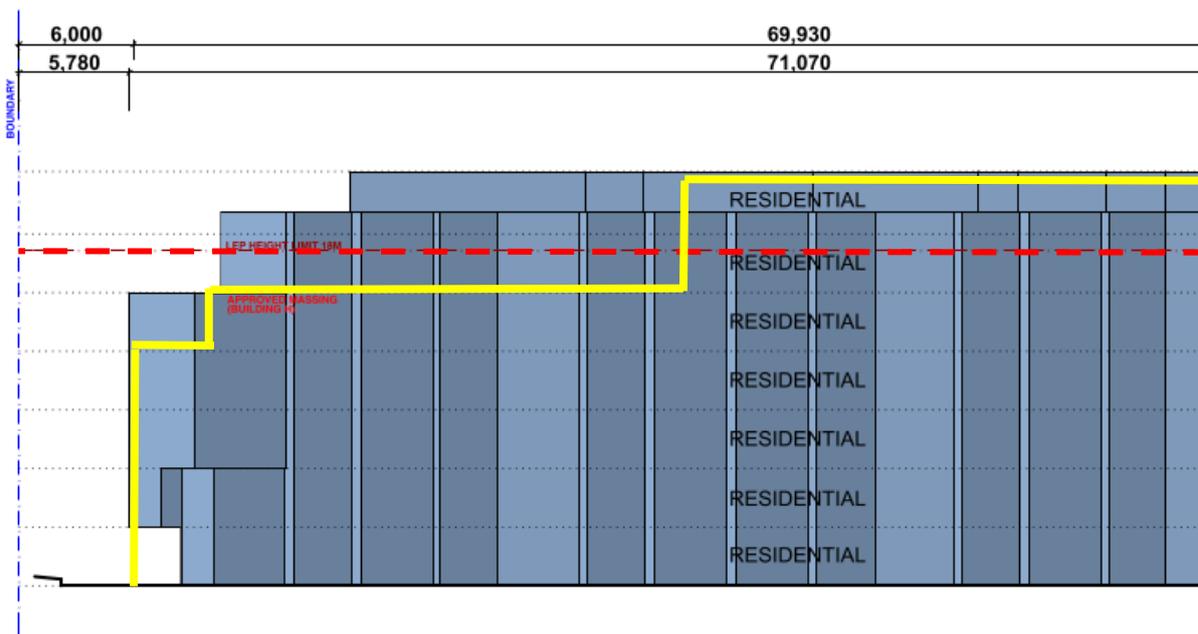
South elevation of building H (Parkside buildings). The yellow line shows the approved concept envelope and the red dashed line shows the 18 metre height limit.
